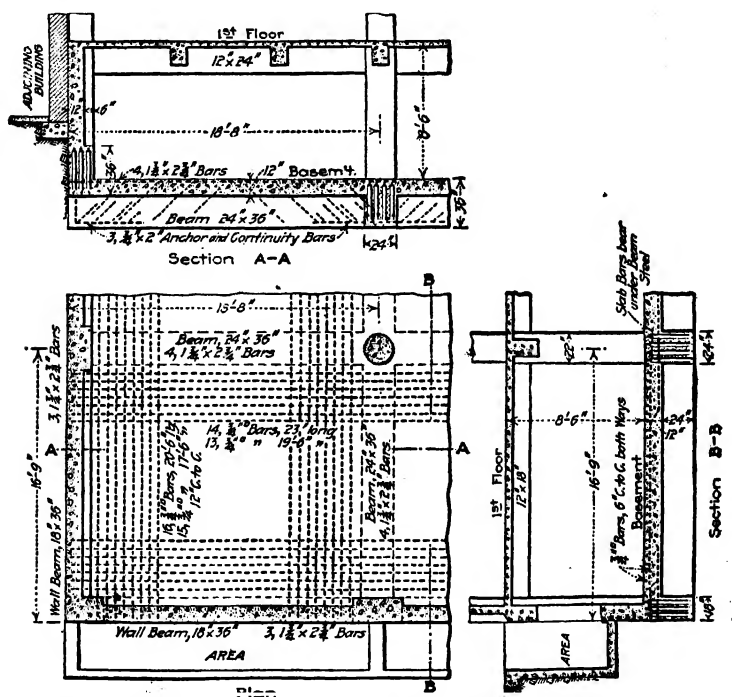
Floating foundation under the Farr & Bailey Manufacturing Co. Building, Camden, N. J.
